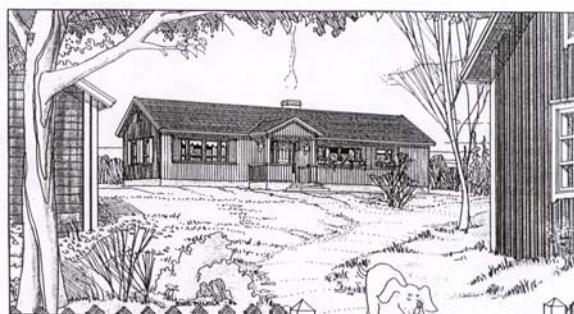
Lessons were learned from tradition in the construction of wooden houses in the 1980s. Once again houses have steep roofs.
